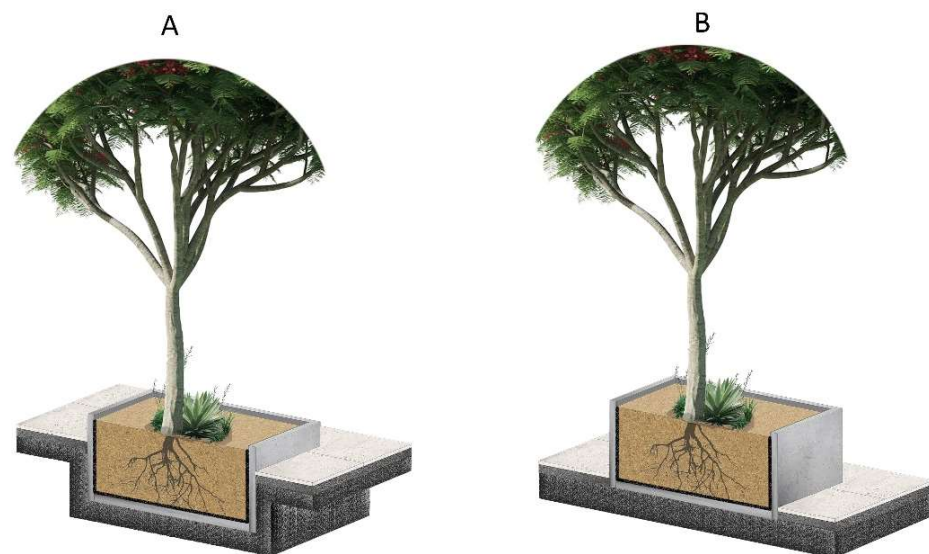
Planter types for implementing trees on buildings. (A) = sunken planter and (B) = raised planter.
